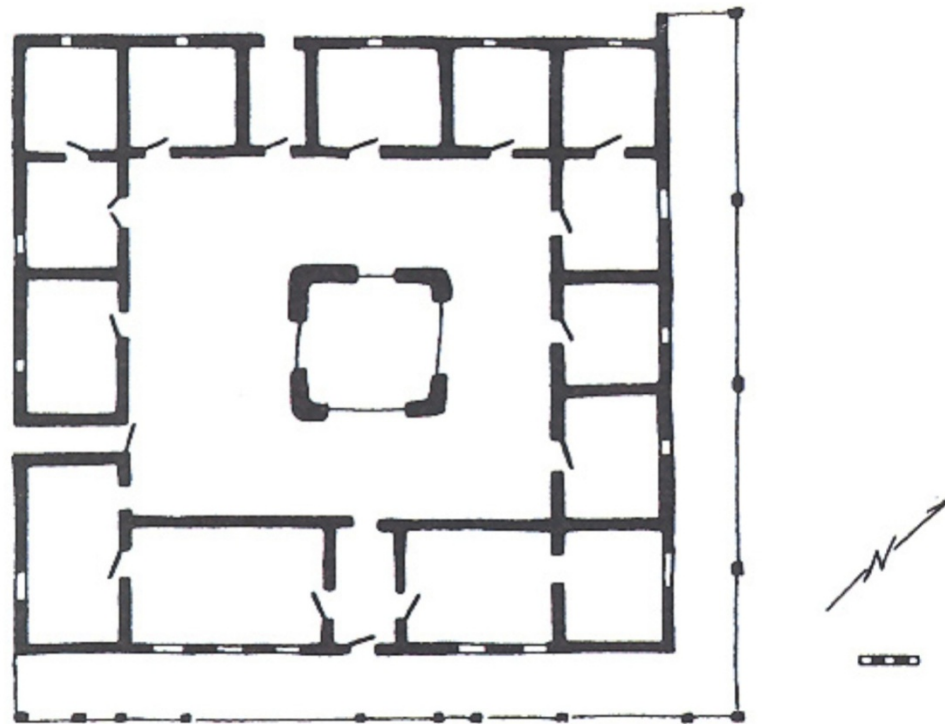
Floor Plan of a Typical Traditional Yoruba Compound.
